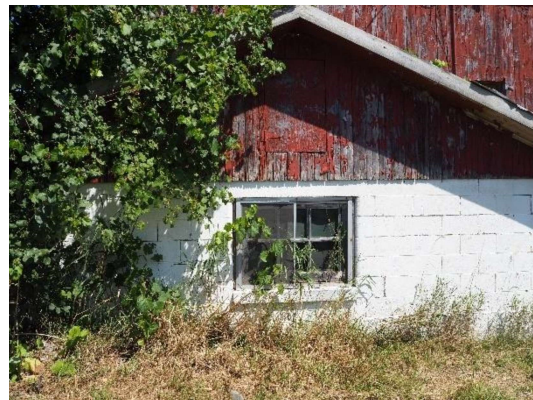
Gabel roof, concrete block addition on south façade, looking north
